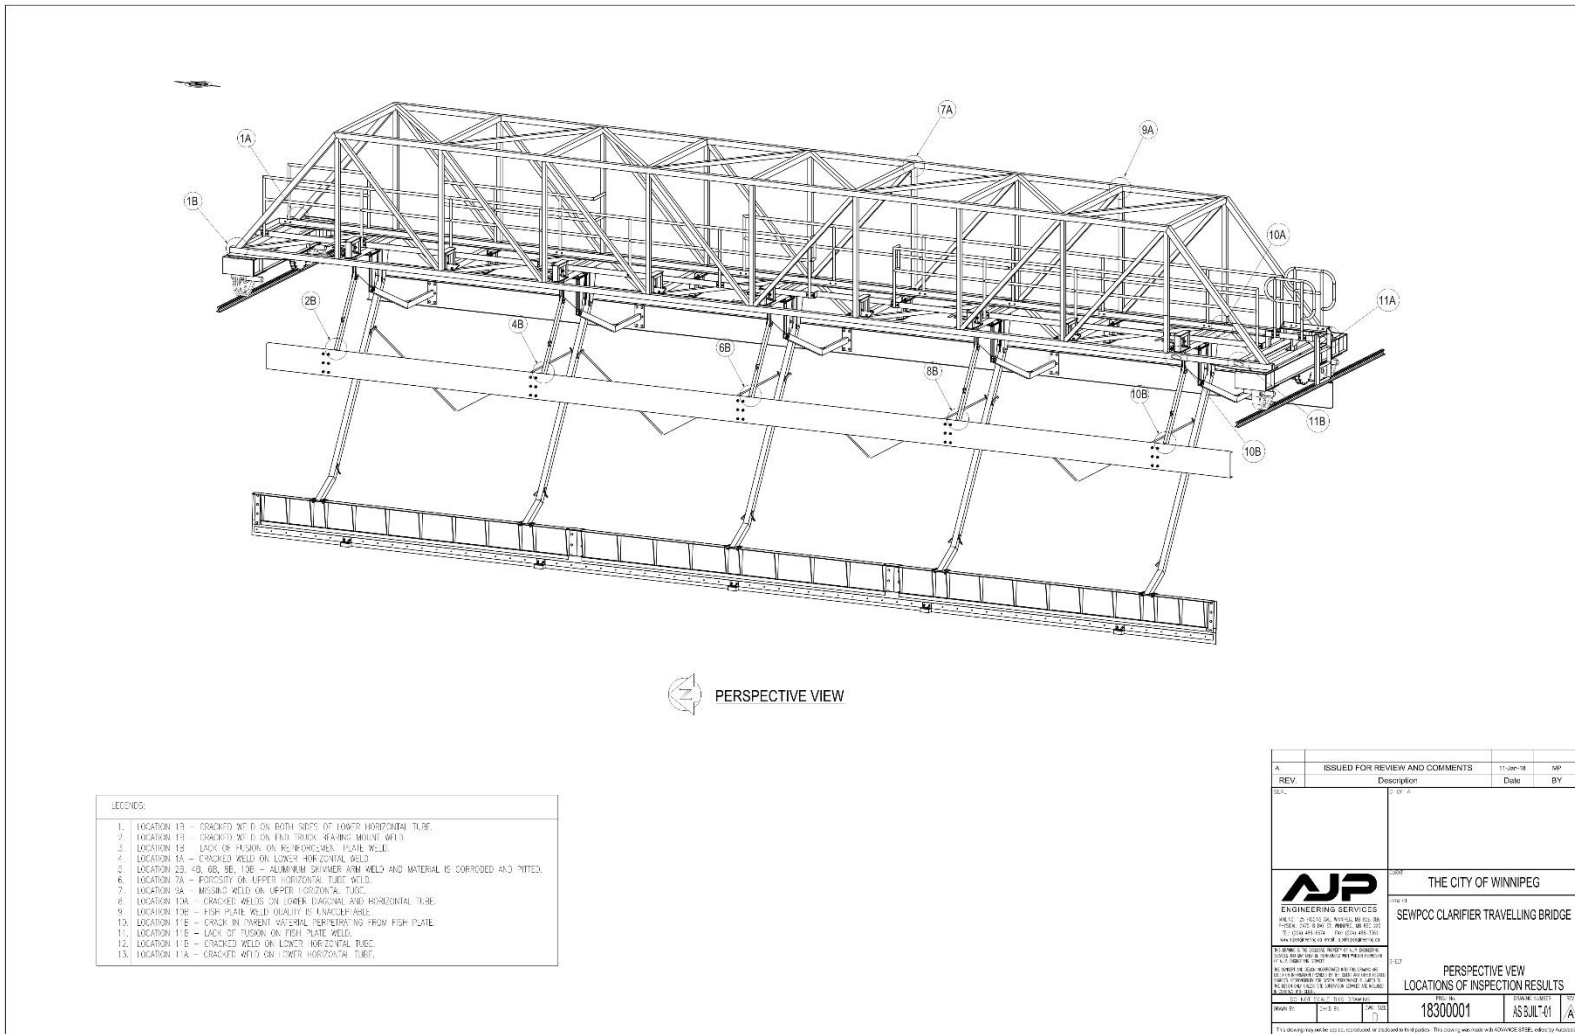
AJP Drawing showing labelling of welds of interest
